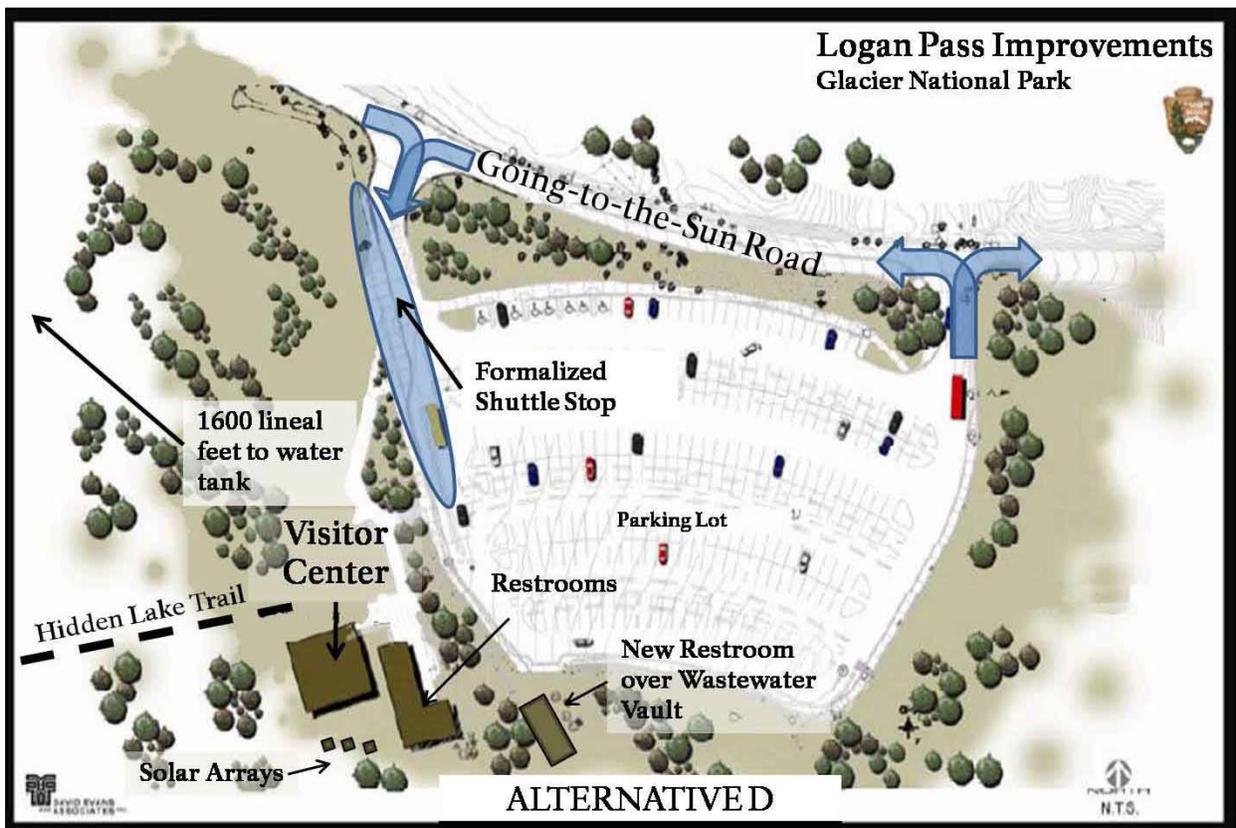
Conceptual layout of solar alternative (DEA 2008)
